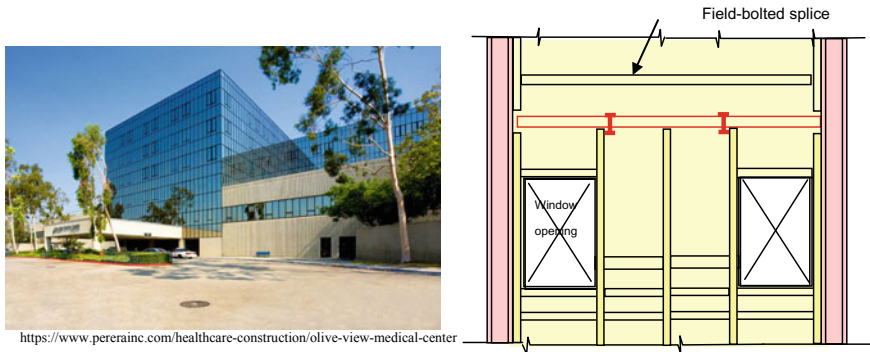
The Olive View Medical Center and view of its typical shear walls
